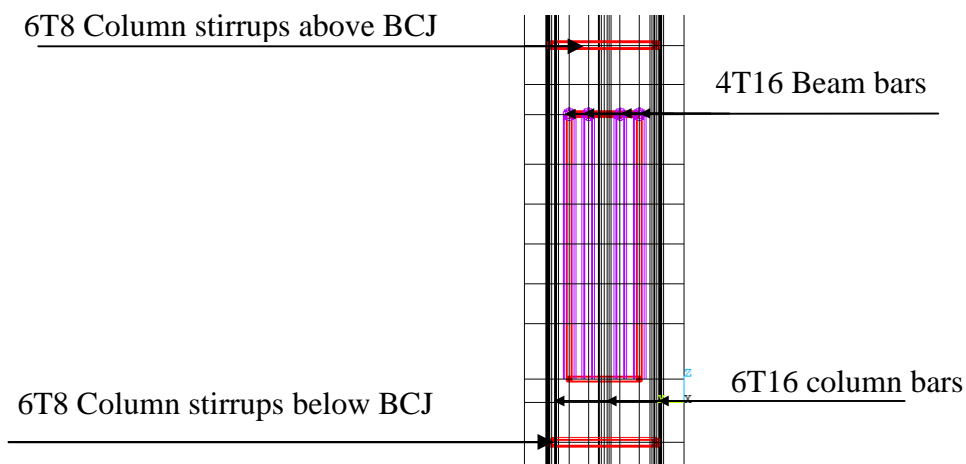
Beam cross section showing the concrete element and the reinforcement cage for column joint BCJ-A
